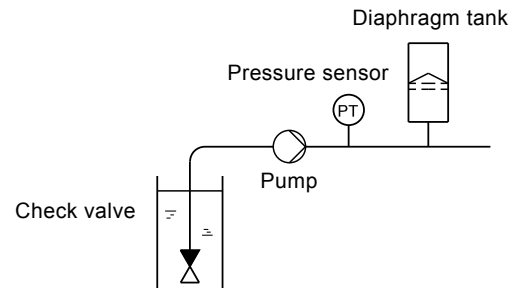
Position of the check valve and pressure sensor in system with suction lift operation
